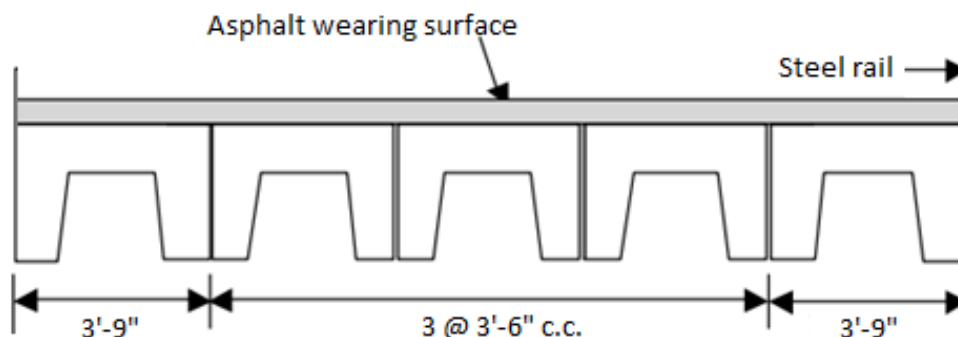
Cross section of a concrete channel beam bridge (modified from Durham et al. 2003).
